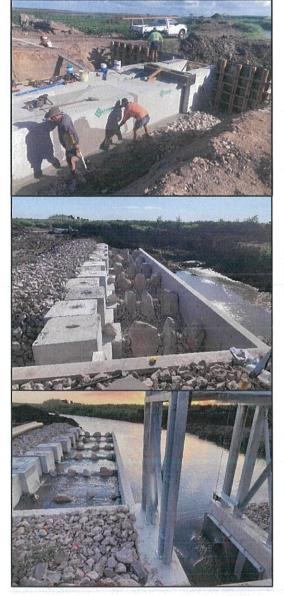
Capital works infrastructure project: Construction of the Warrens Gully Pump Station outlet structure, new inverted siphon and Barry Road culvert crossing.
